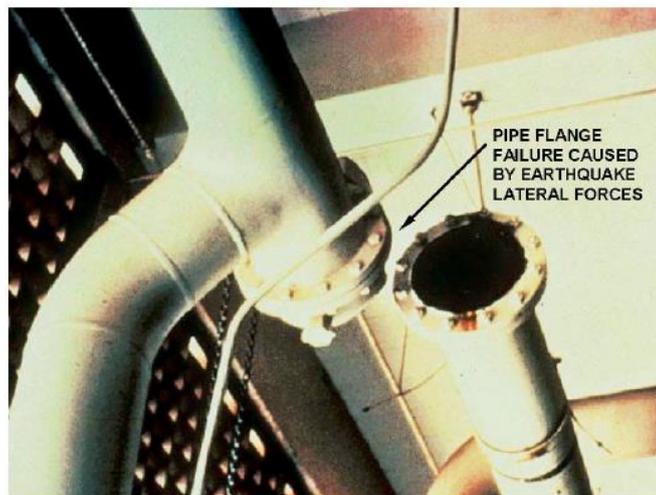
Photo of pipe flange failure caused by earthquake lateral forces.
